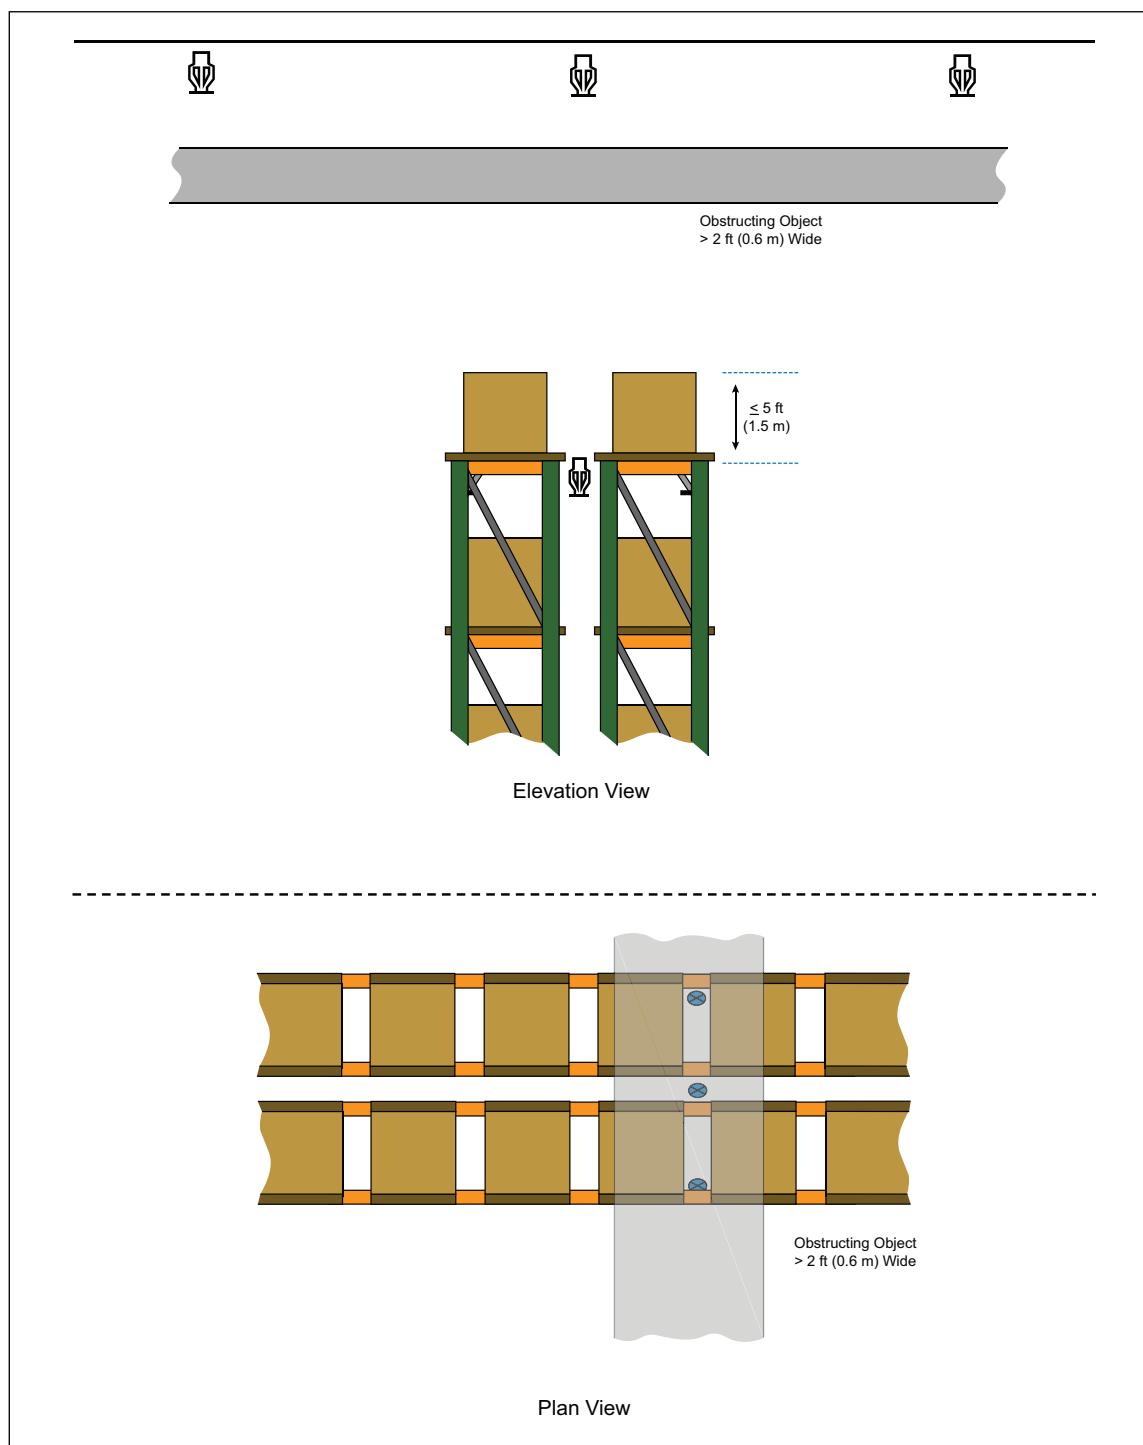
Supplemental ceiling-level sprinklers installed within a storage rack below an obstruction over 2 ft (0.6 m) wide
